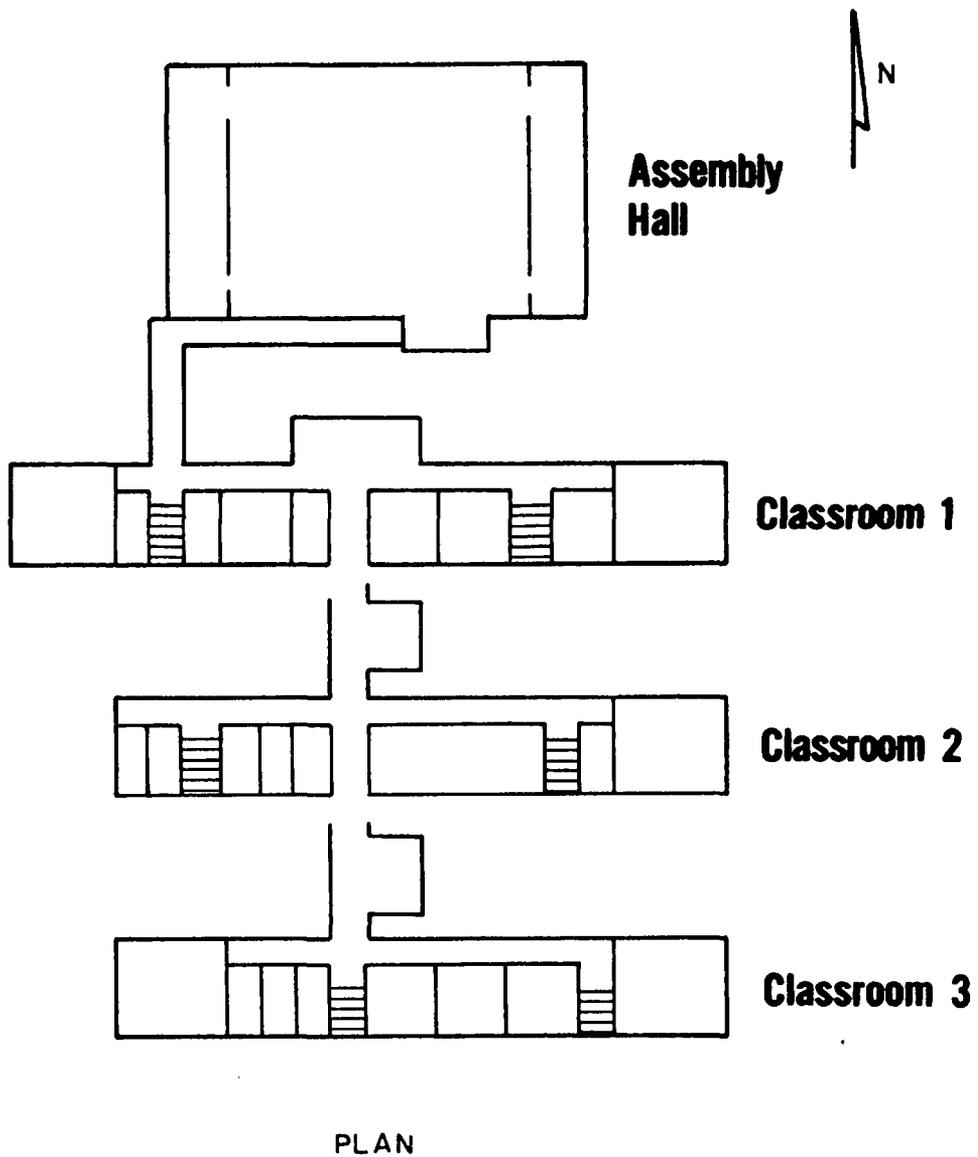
Izumi High School, Izumi City. Plan view of steel frame assembly hall and three reinforced concrete classroom buildings.
